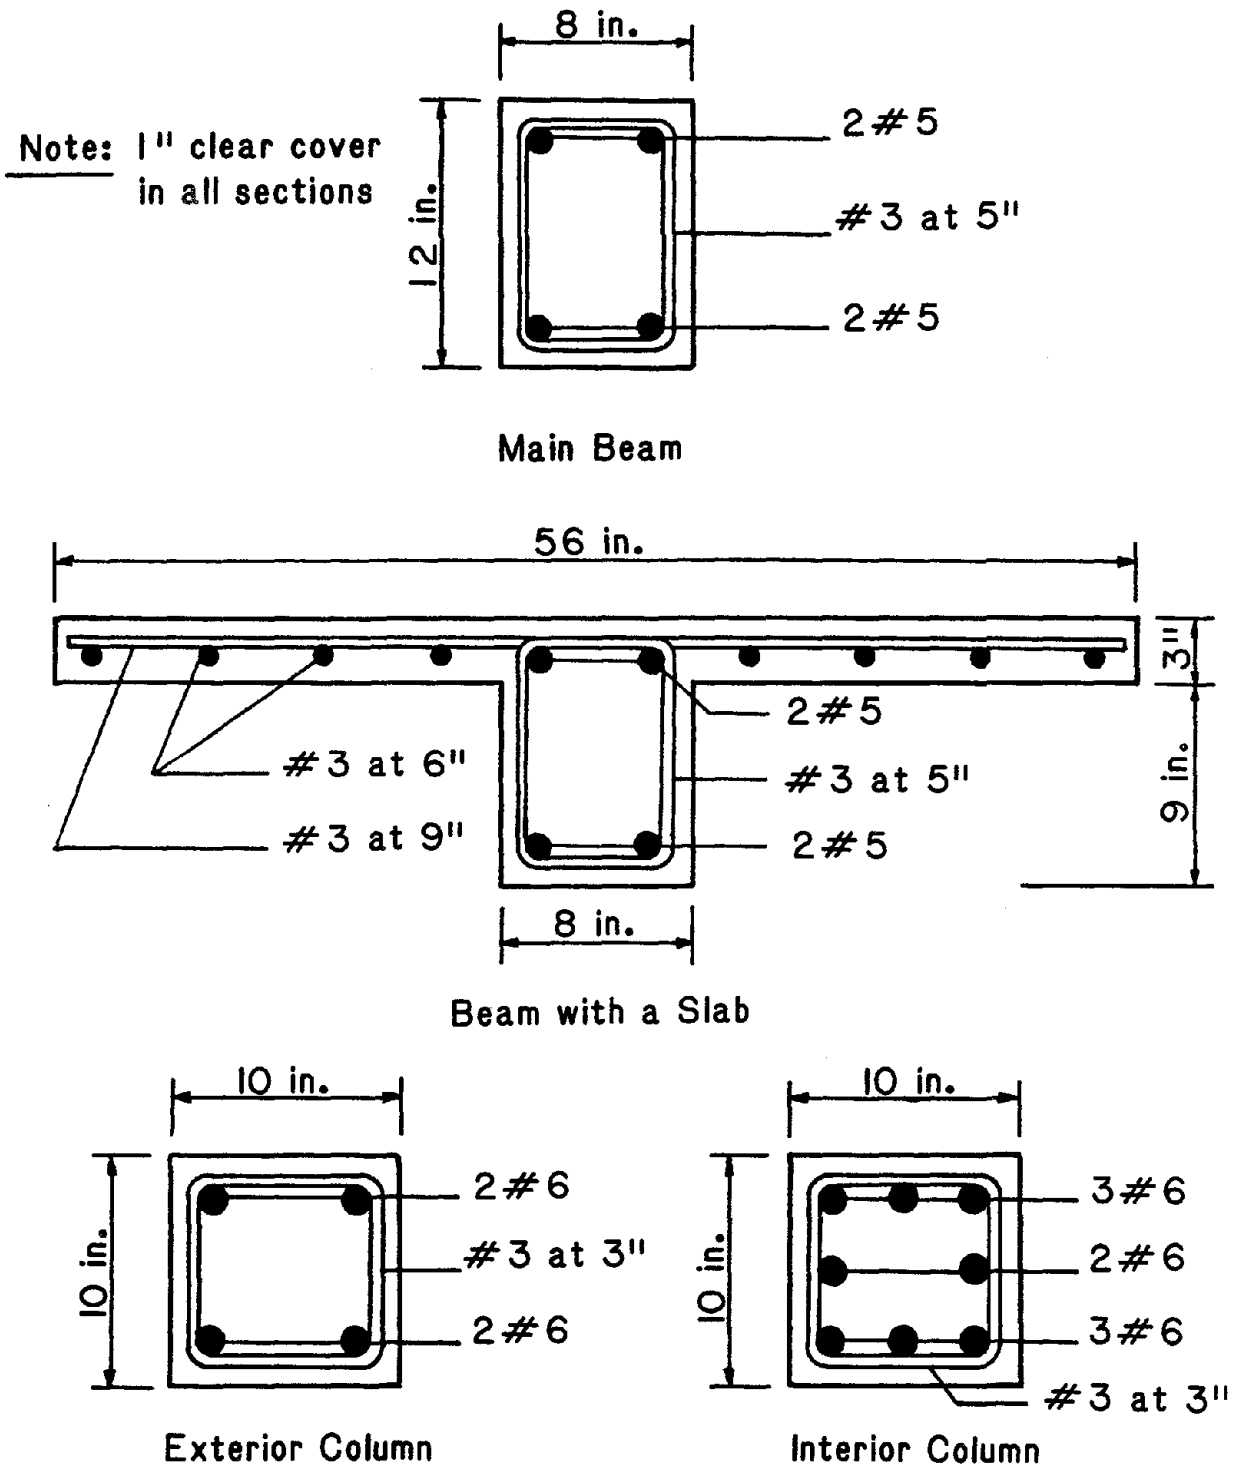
(a) Cross-Sections of Main Beams and Columns
